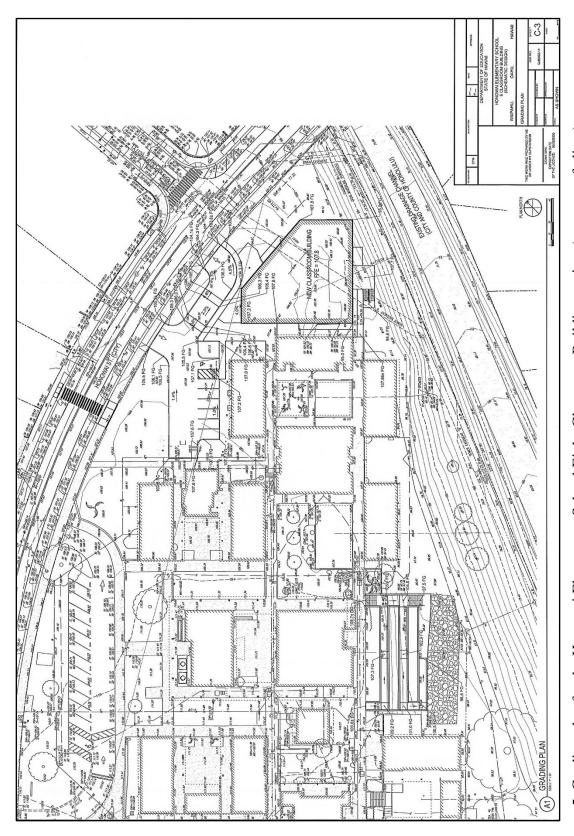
Grading plan for the Honowai Elementary School Eight-Classroom Building project (courtesy of client)
